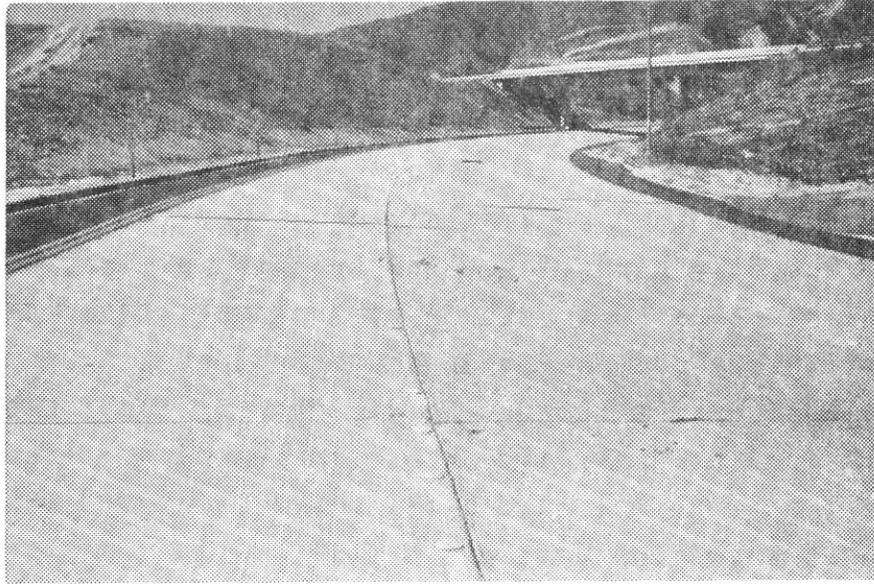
Looking northwesterly at pavement slab displacement through cut/fill zone on Connector D-Y.
